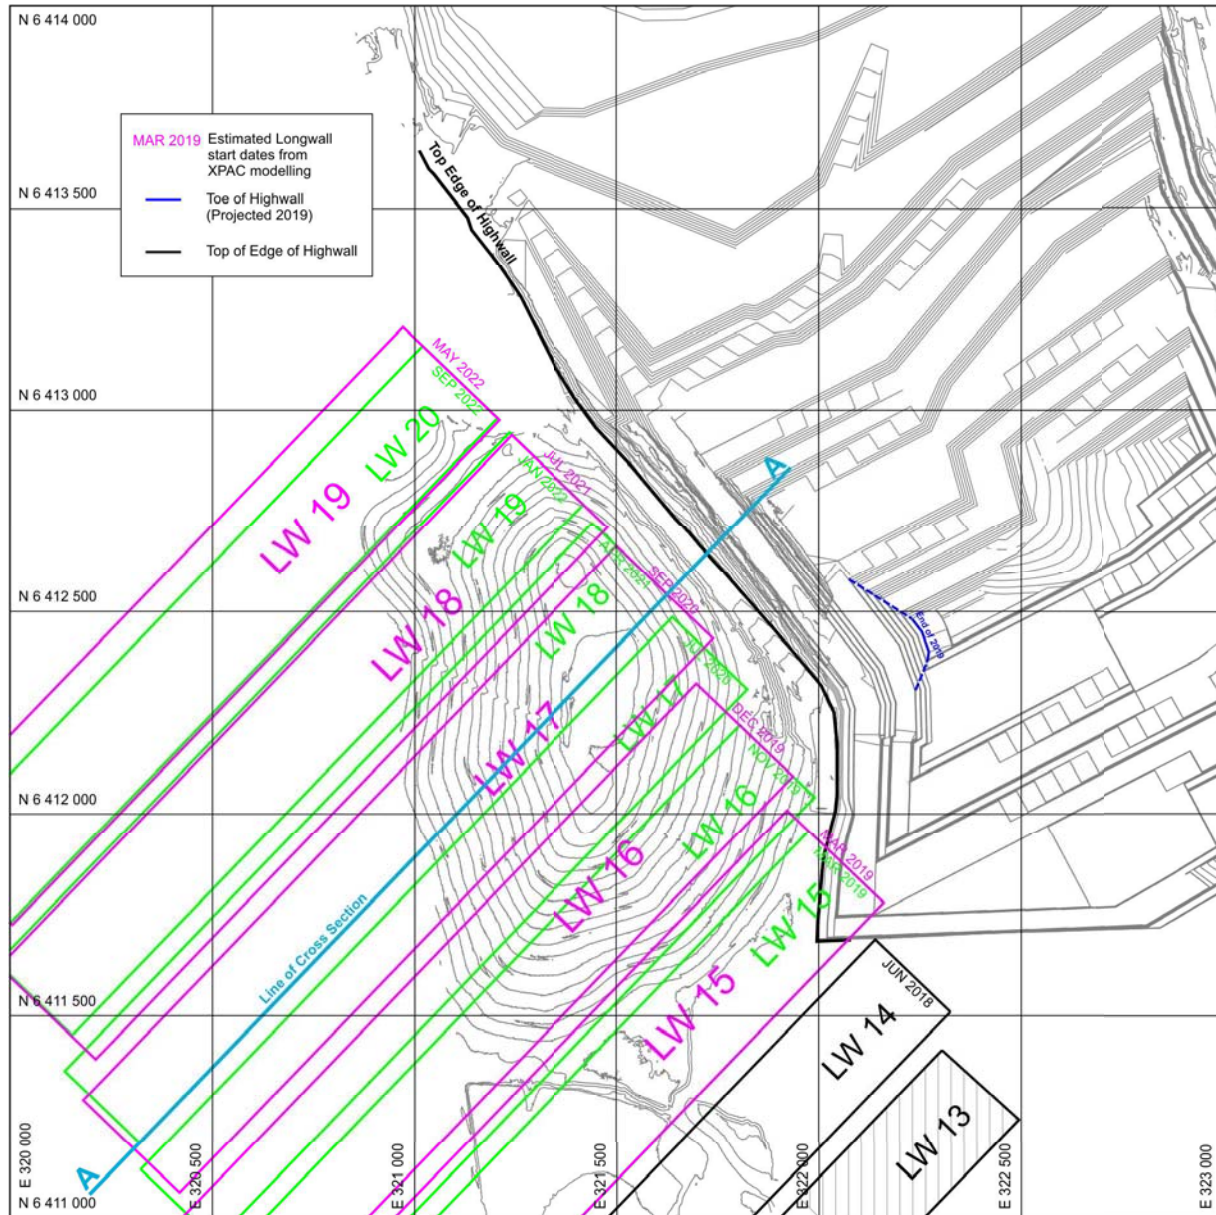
Site plan showing open cut mining at Mt Owen North Pit and the relative positions and start dates of existing and IUG proposed longwall panels. The Mt Owen open cut is projected to the end of 2019. The longwall start dates are estimated for the revised geometry.
